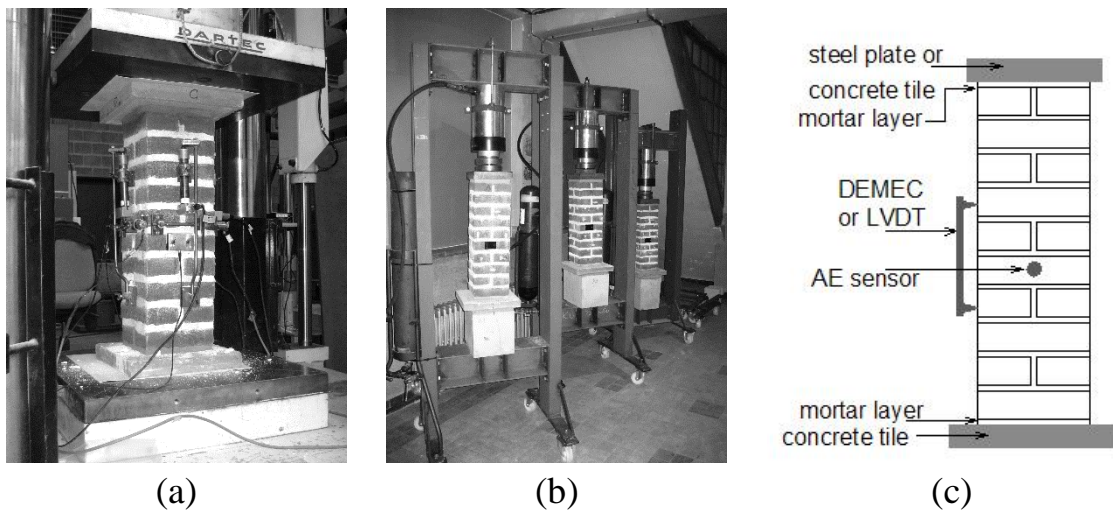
(a) short-term and (b) long-term creep test setup, (c) schematic view of a masonry sample.
